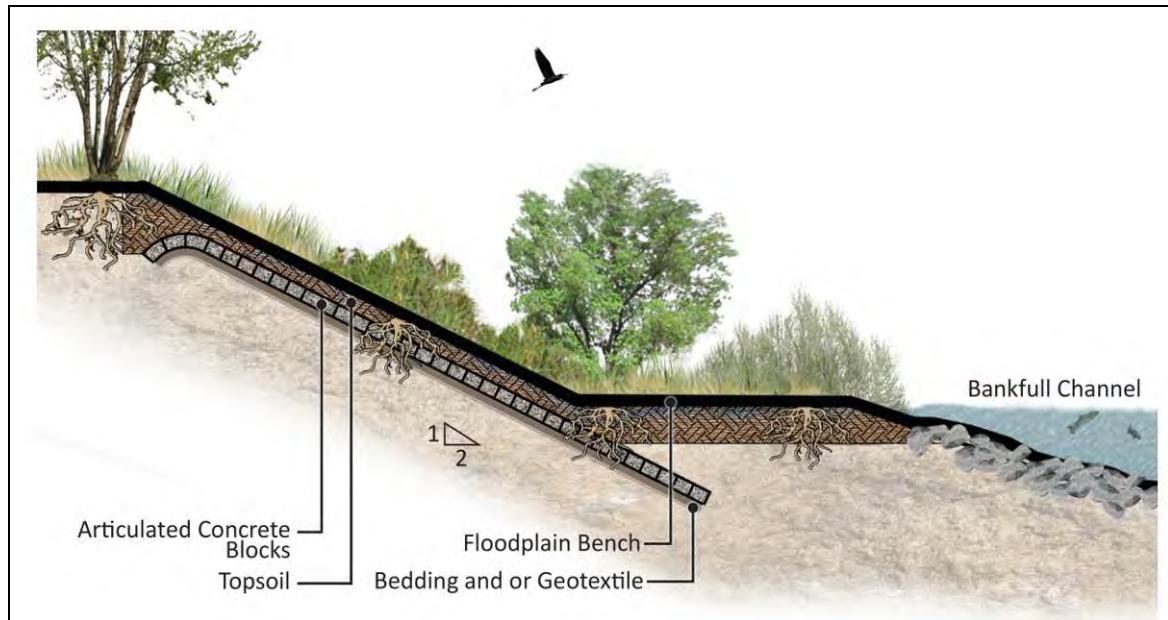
Bank Stabilization treatment, Articulated Concrete Blocks, 2H:1V slope.
